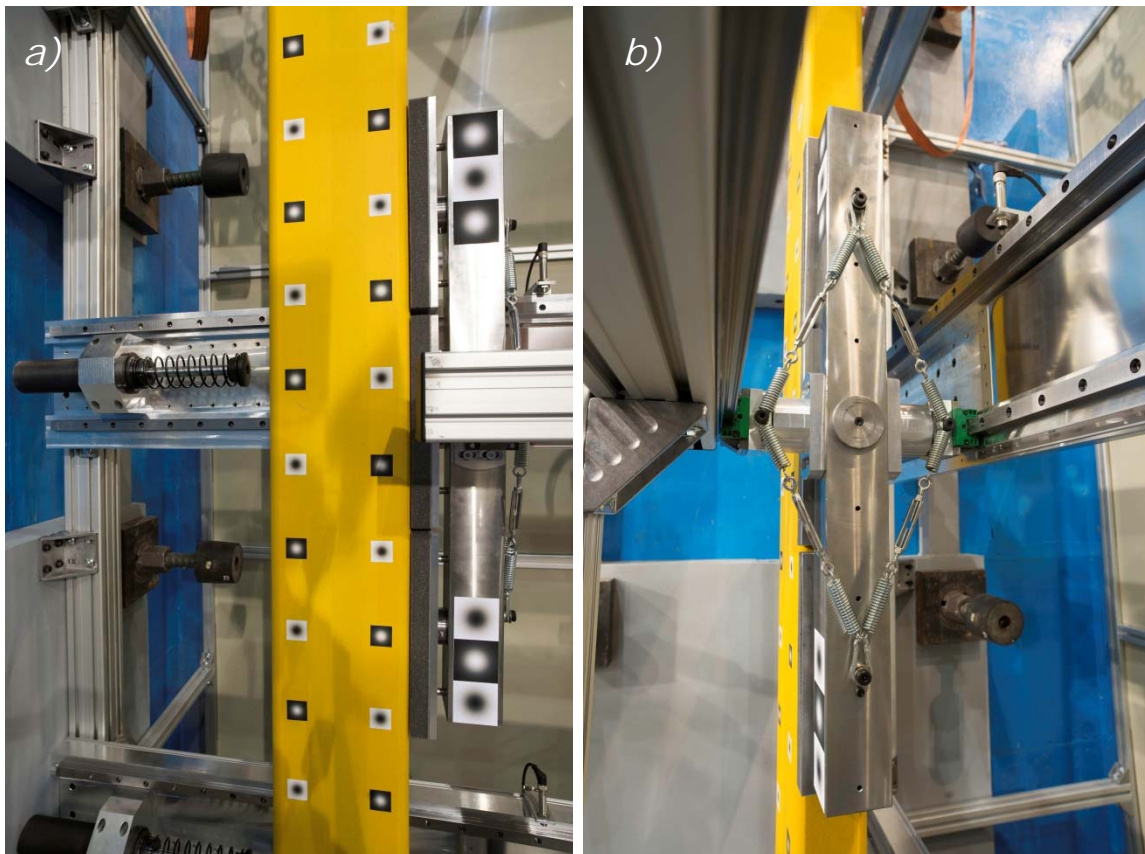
a) Impacting mass against the specimen and b) detail of stabilization springs
